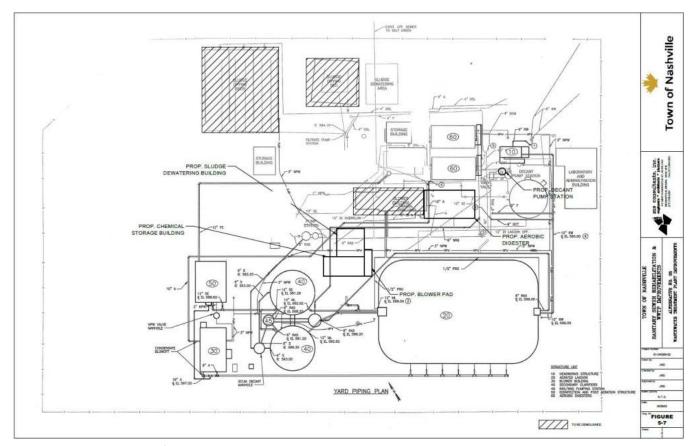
WASTEWATER TREATMENT PLANT IMPROVEMENTS
